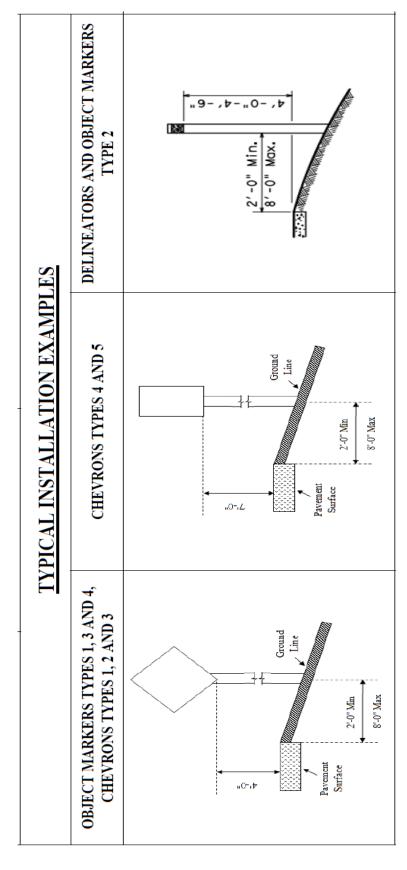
"Typical Installation Examples" Section in the Proposed New Layout TxDOT D&OM(1)-11, Options #1 and #2.
